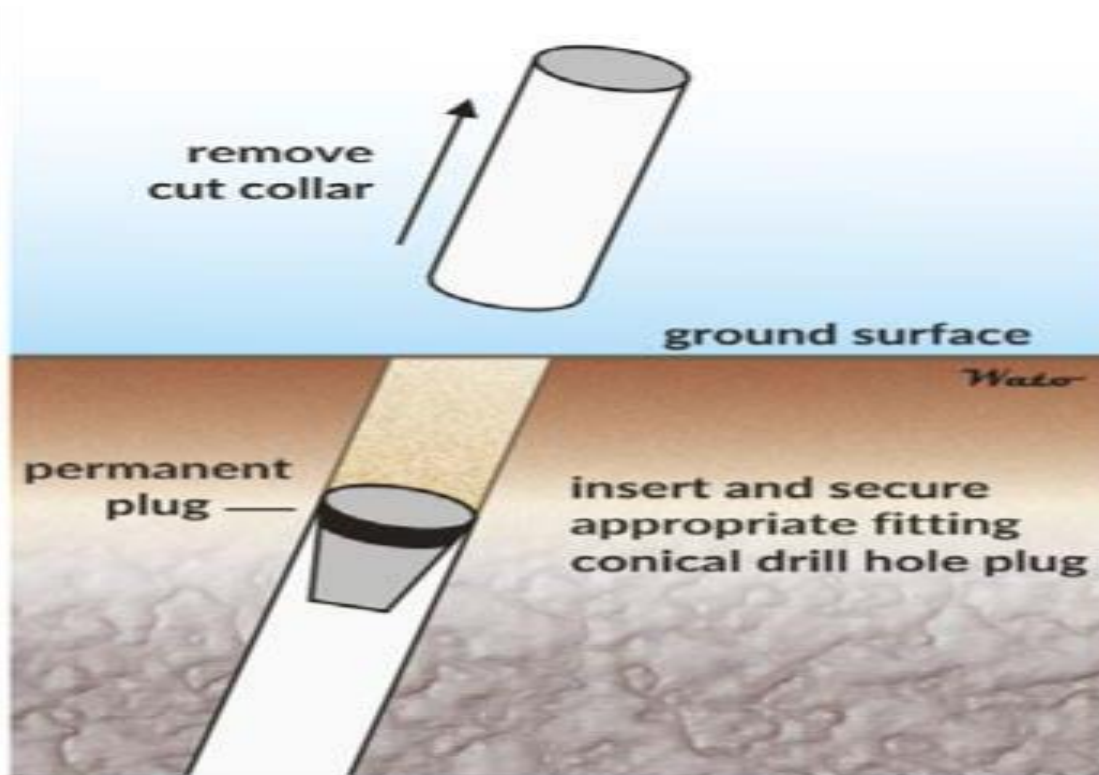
Showing the PVC collar cut at 1 m below the earth surface, the cap is then installed.
